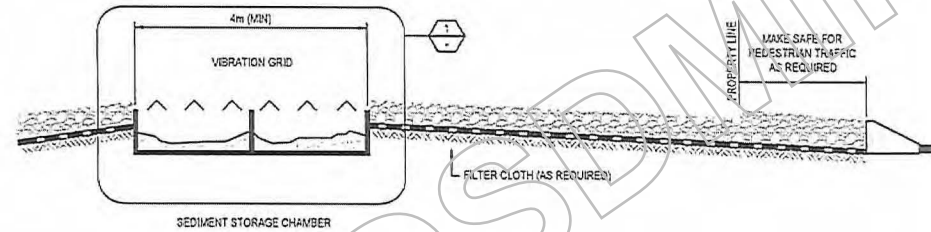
TYPICAL LAYOUT OF VIBRATION GRID WITH ROCK RAMPS
